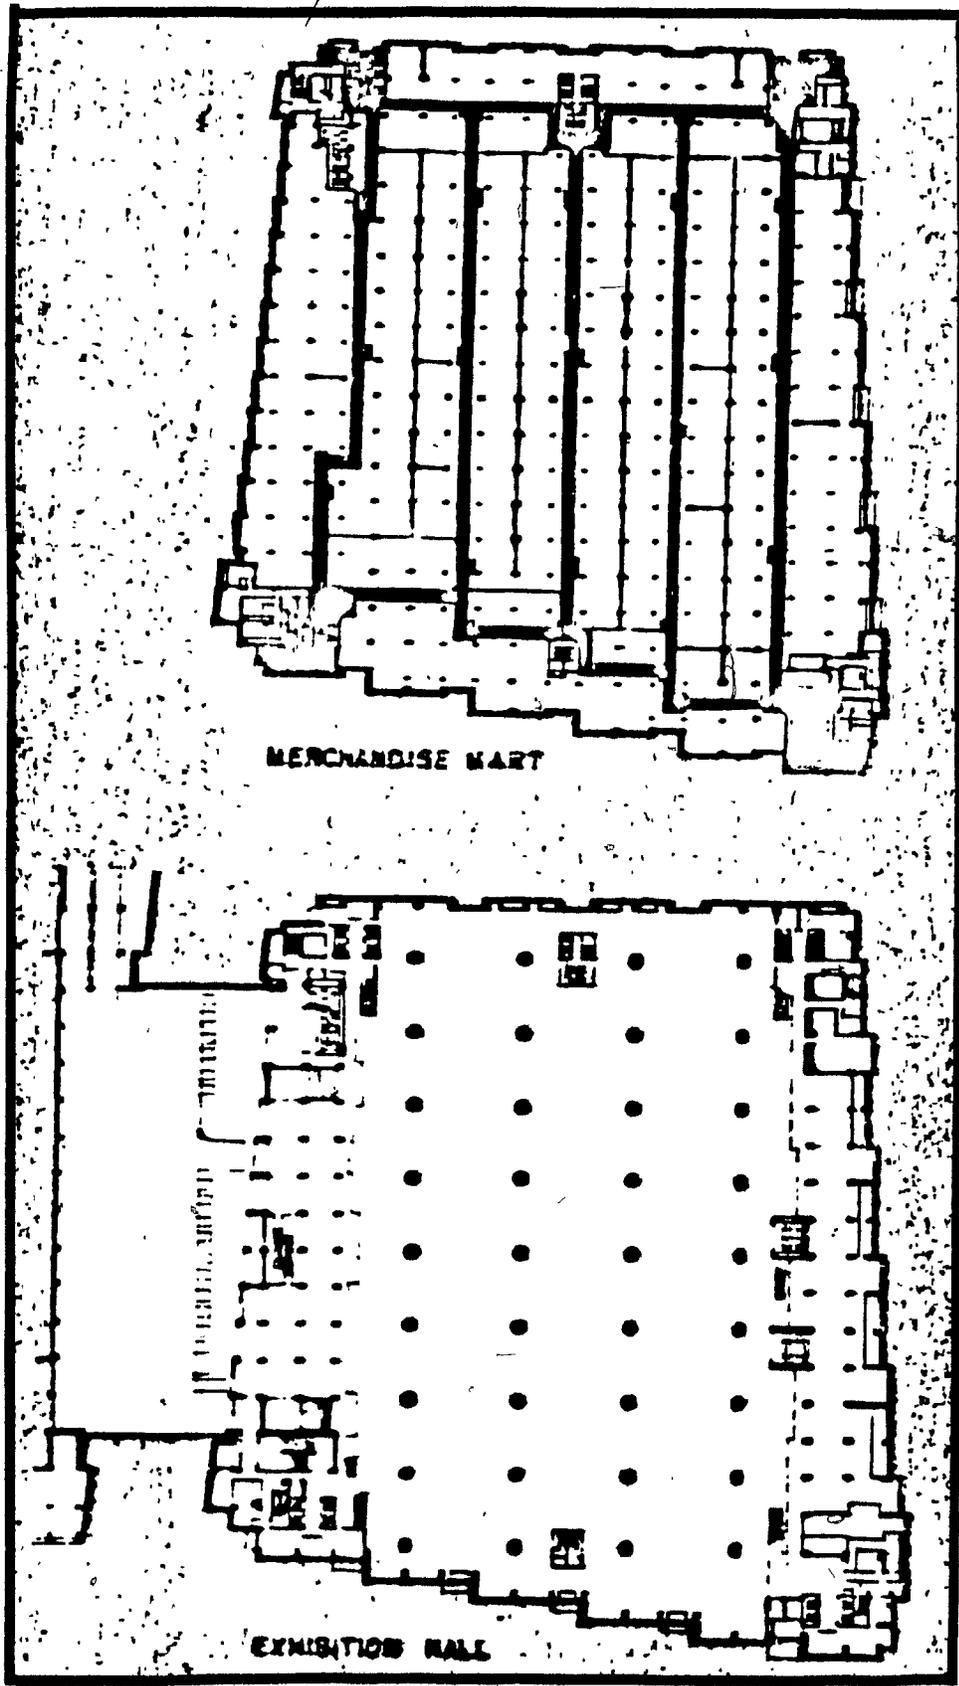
,3 : Place Bonaventure, floor plans of Merchandise mart and exhibition hall.
